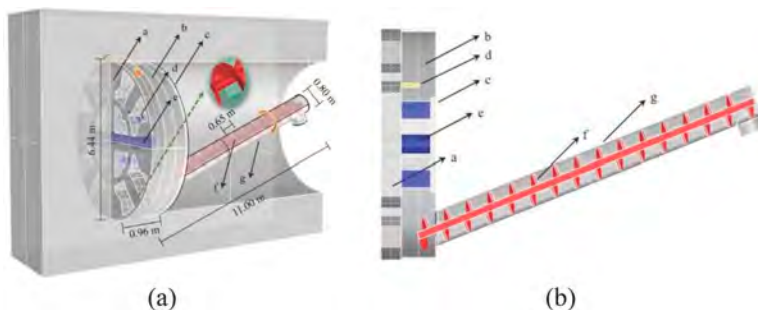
Geometric model of shield machine: (a) main view; (b) cross-section (a. cutterhead, b. chamber, c. bulkhead, d. mixing rod, e. support shaft, f. screw, g. the shell of conveyor).
